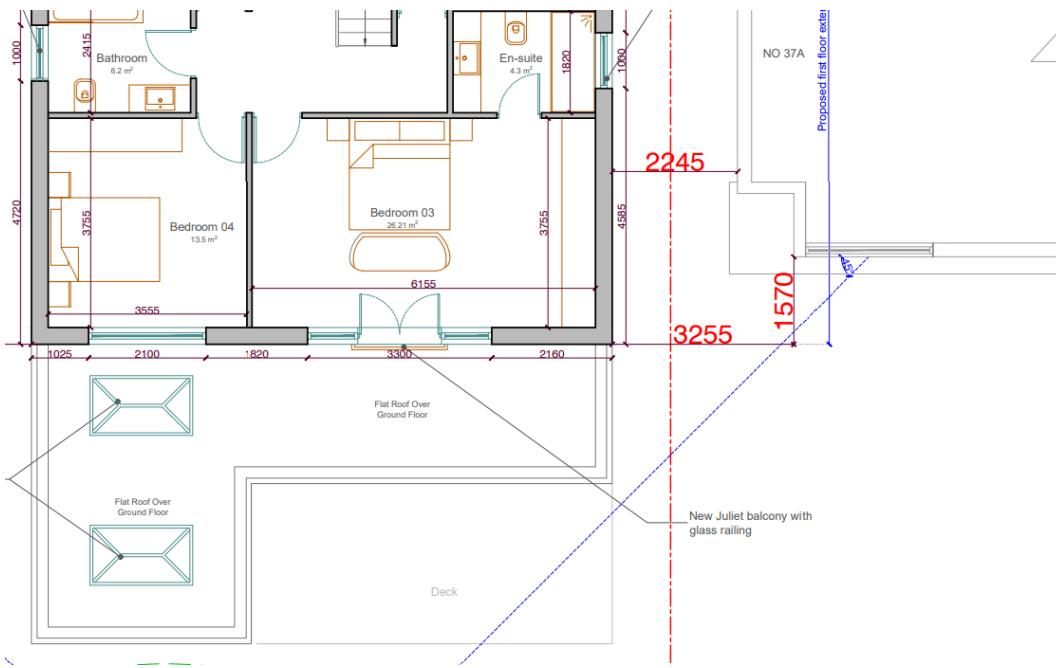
Excerpt of proposed first floor plan showing the rear dormer window at no.41 in relation to the proposed first floor building line.
